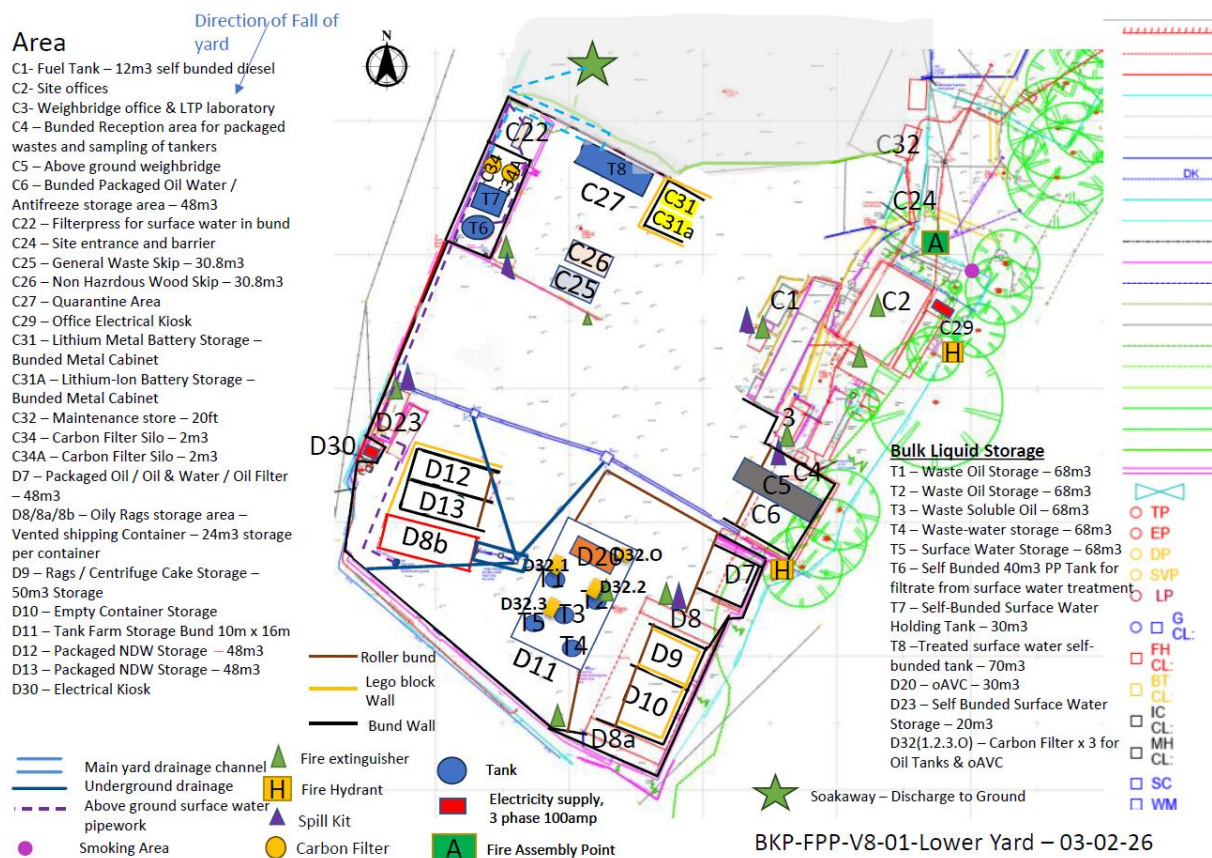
Lower yard layout – N.b. 2 x Fire Hydrants shown on right hand side of site
